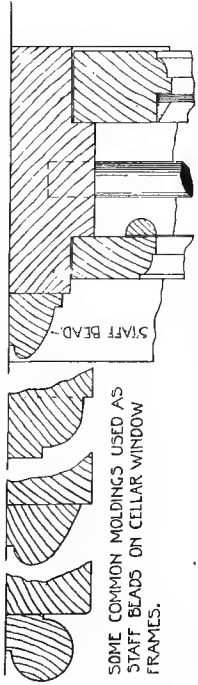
DETAILS OF AN ORDINARY CELLAR WINDOW IN A STONE WALL.
